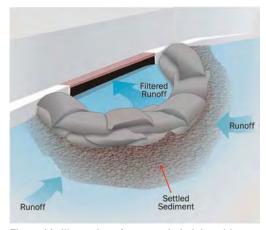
Illustration of a storm drain inlet with rock-filled bags filtering stormwater.
